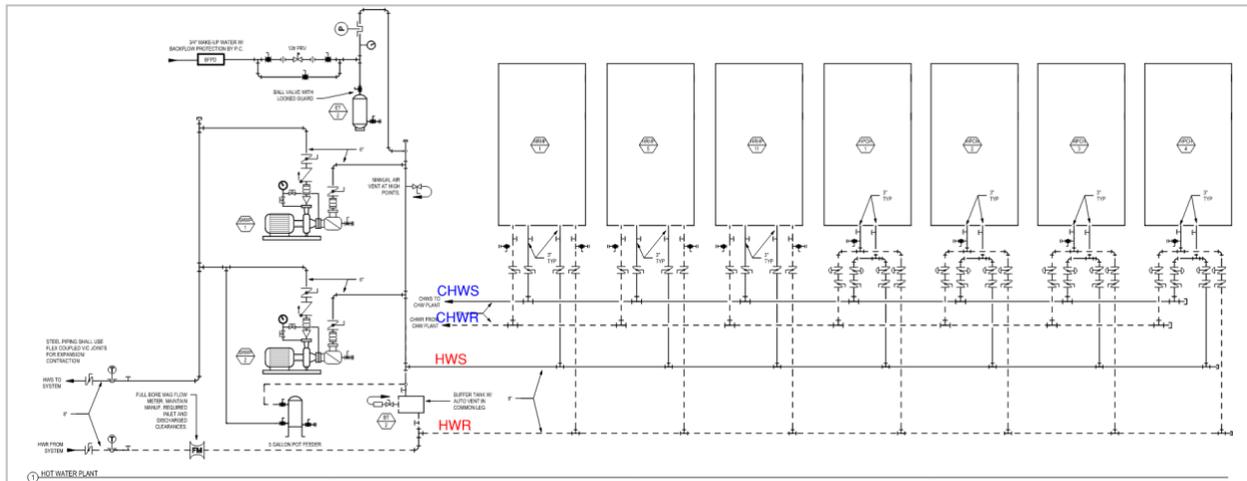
Typical CHW/HW Plant with 2-Pipe and 4-Pipe AWHPs
